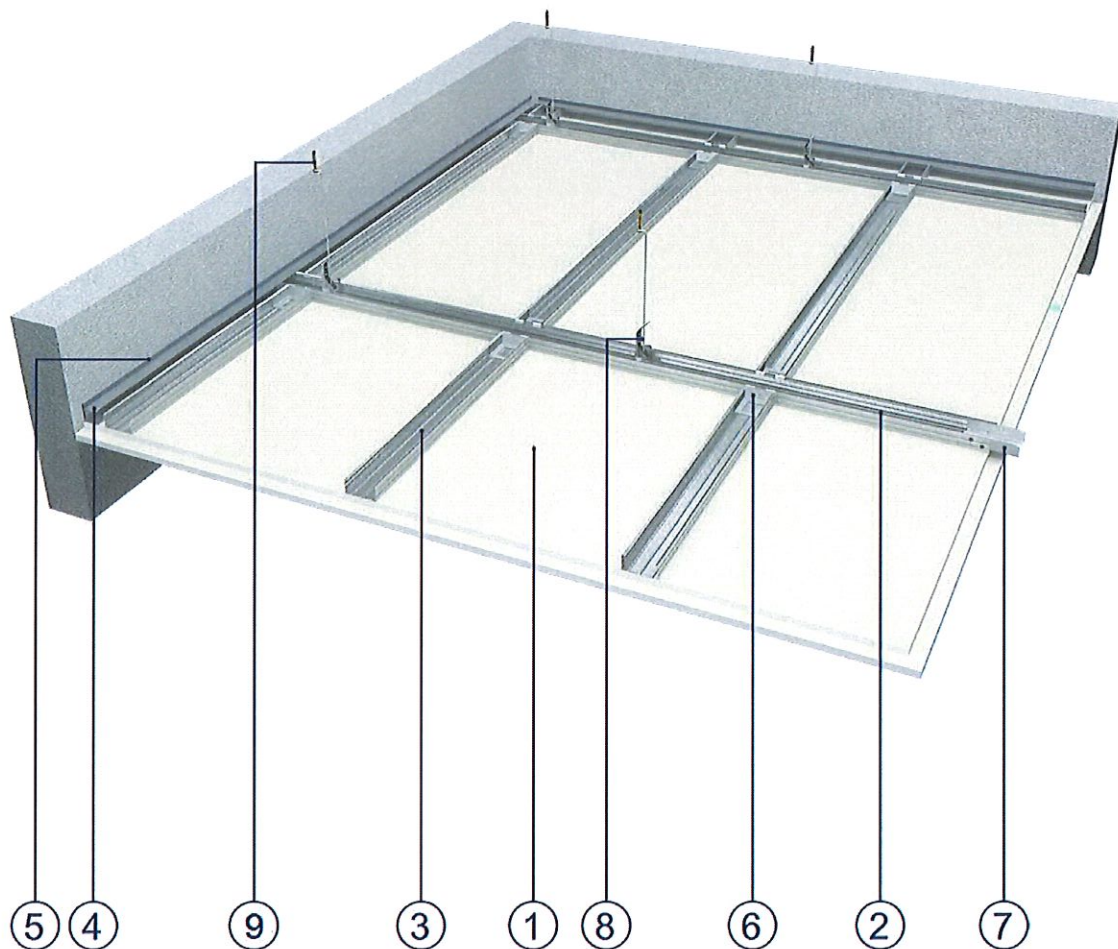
Cross section of the suspended ceiling – two level cross construction
